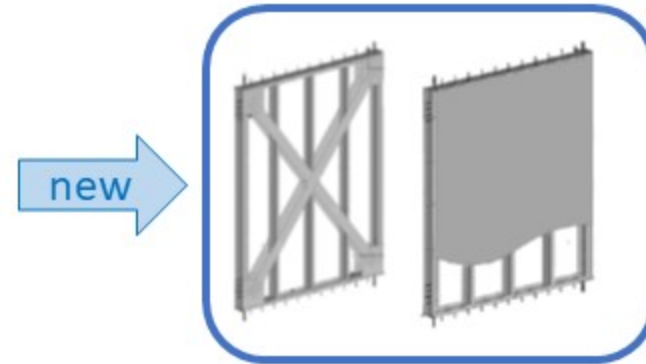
Lightweight steel systems: a) Strap braced walls; b) Shear walls with steel sheet or wood sheathing or gypsum sheathing
